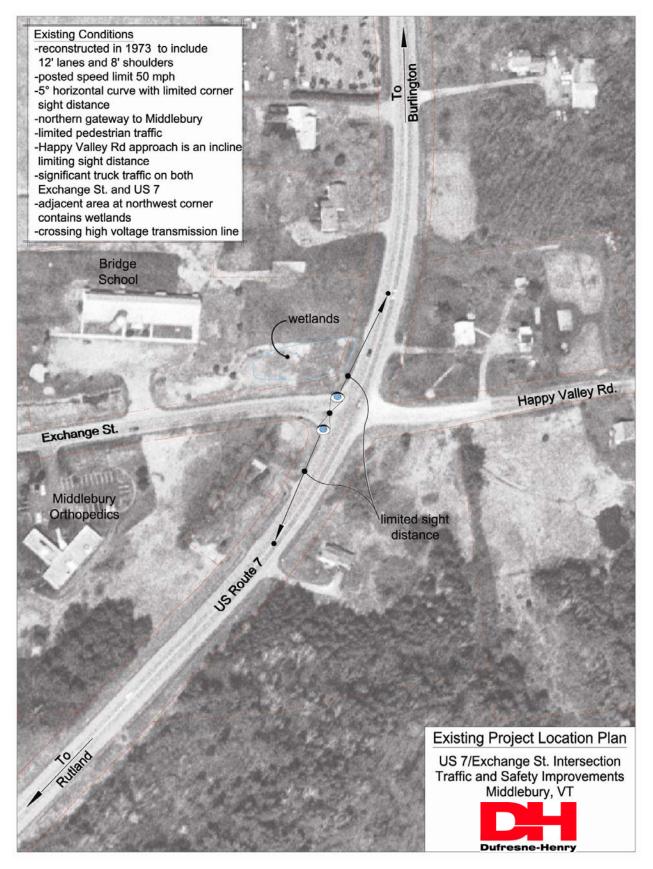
Existing Project Location Plan for the Exchange Street / Happy Valley / Route 7 Intersection.
